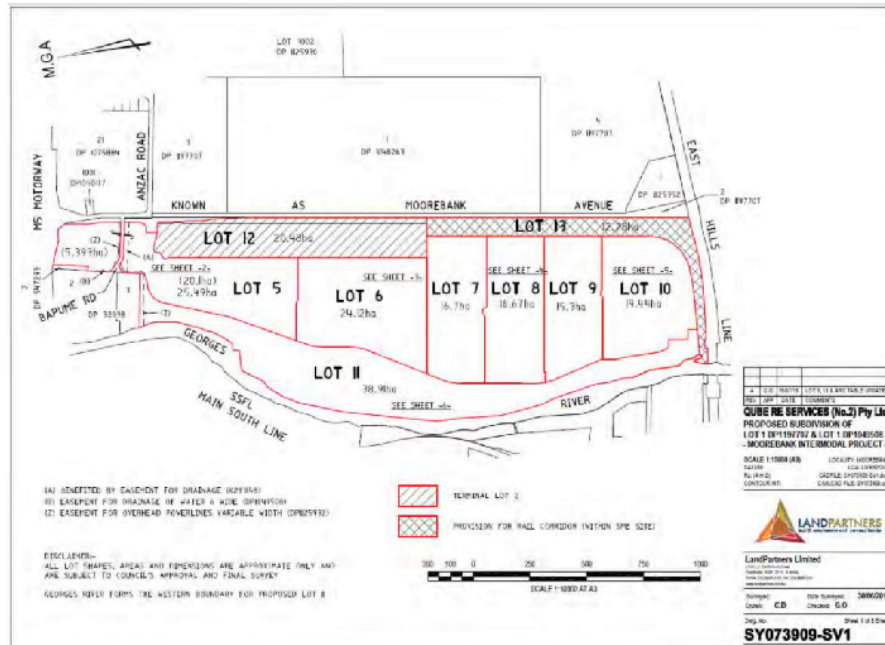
Proposed Subdivision Plan MPW Stage 3
